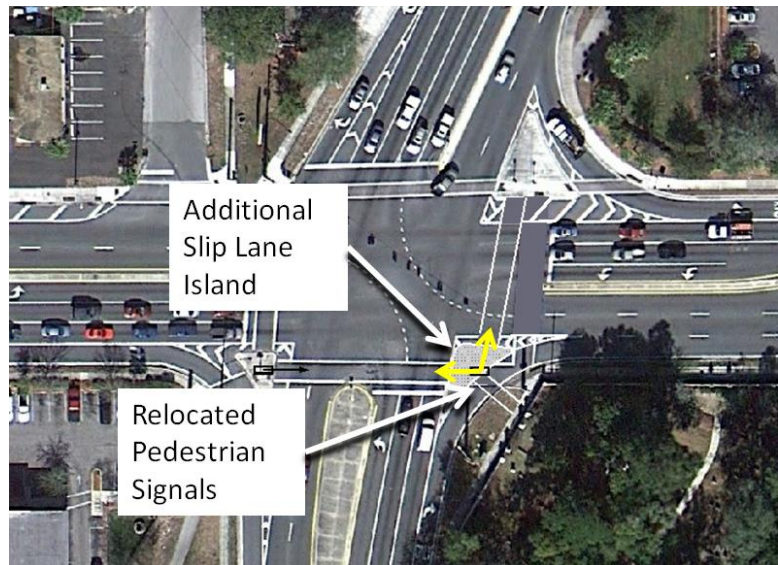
SR 26 and Waldo Road, Modified Southeast Corner
